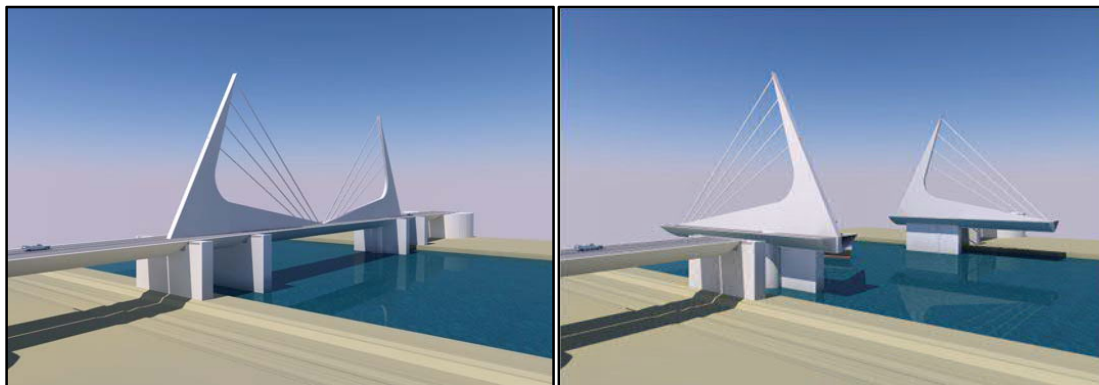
Swing Bridge Aesthetic Concept (indicative)
